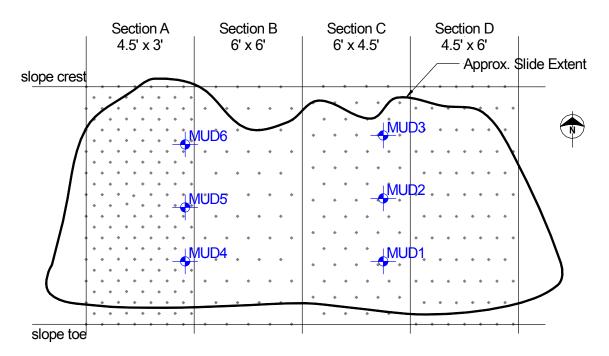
Plan view of US36-Stewartsville site showing approximate boring locations.
